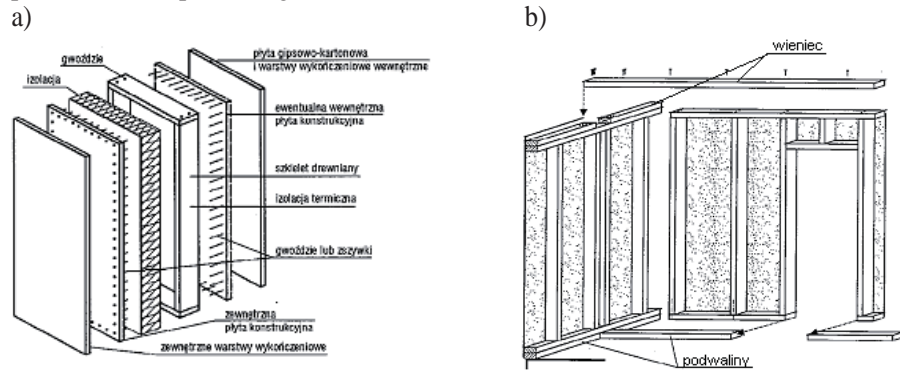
Wall diaphragms (panel) construction in plate buildings construction: a) structure of the single unit wall plate, b) joining of the neighboring walls using timber tie.
